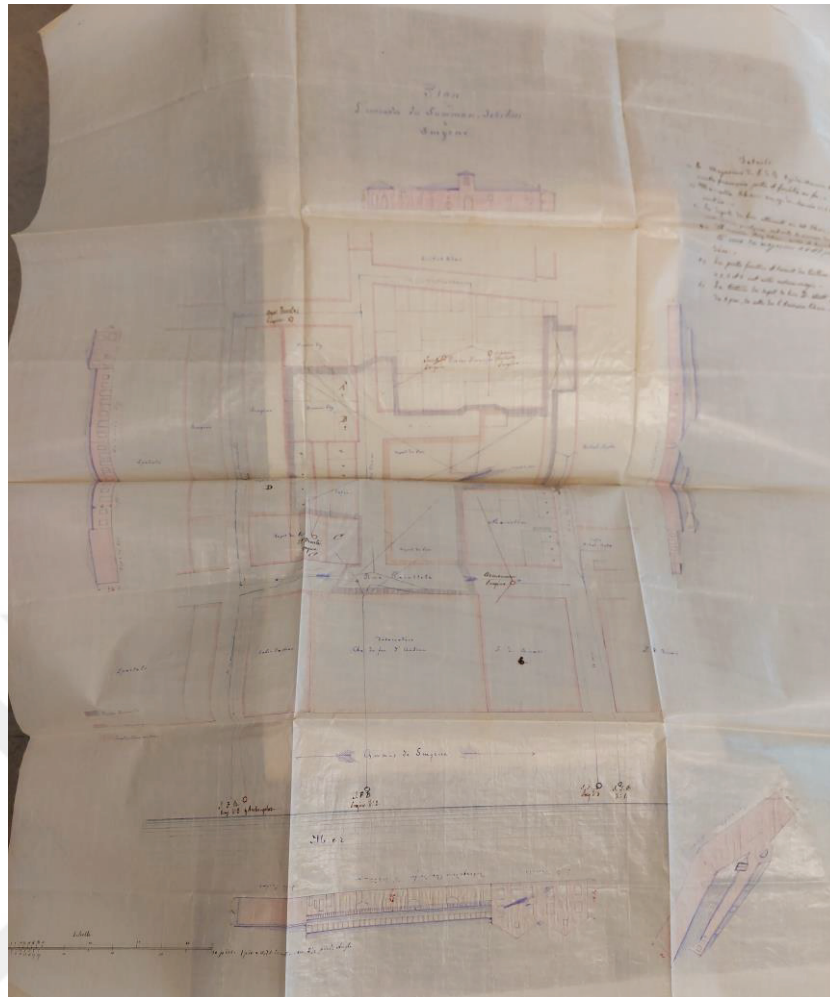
Plan of Saman İskelesi showing waterways, facades, and plans of buildings, 1879, by Sun Insurance Fire Brigade⁵⁹⁷
